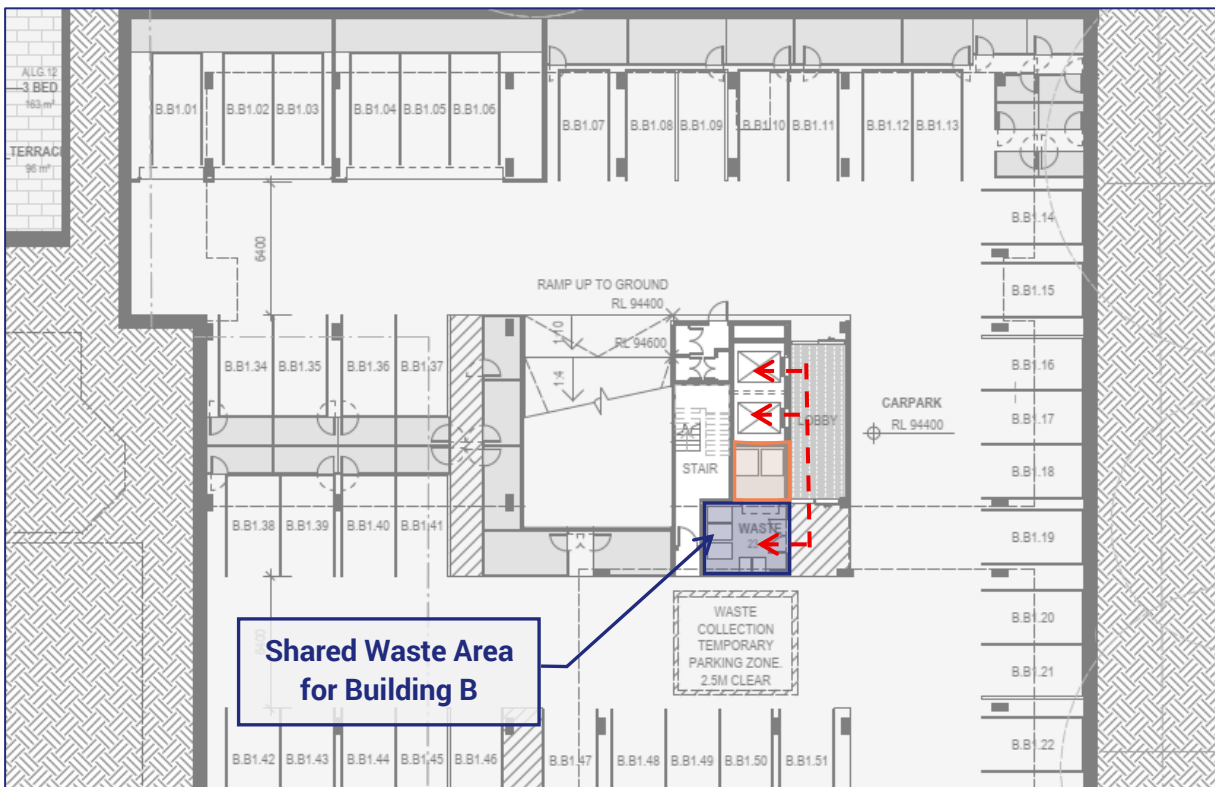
Shared Waste Area & Pedestrian Access Route Building B
